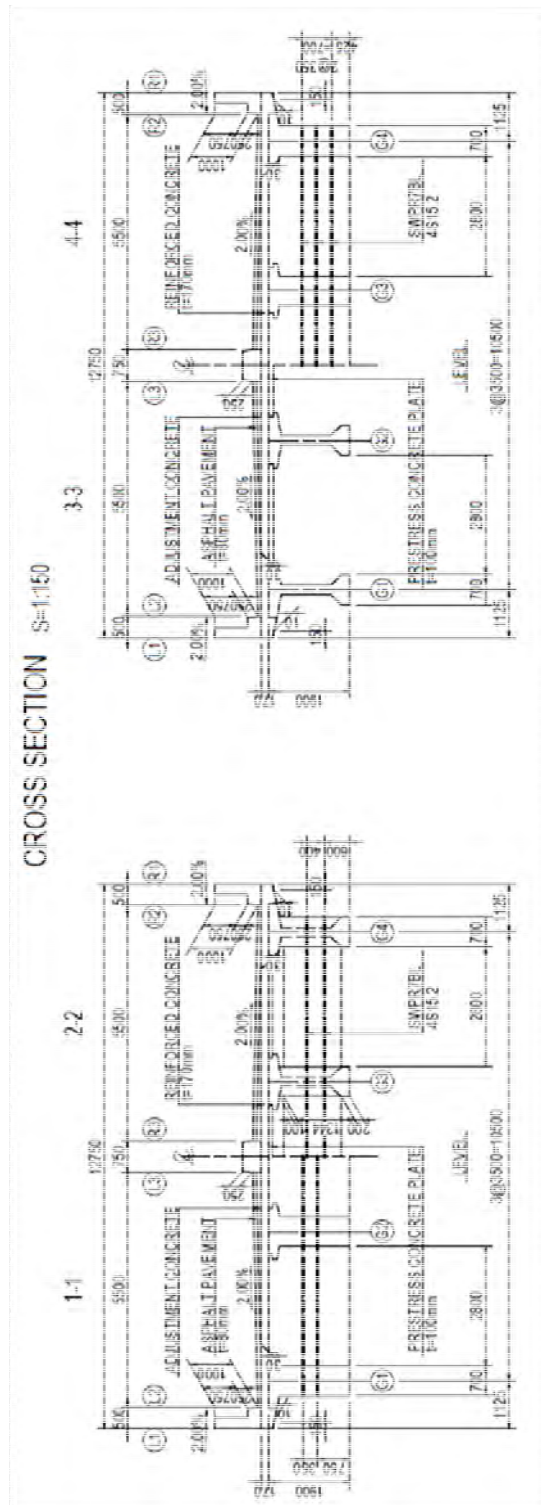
and Figure 4.6.43 show the profile, plan, and cross section of PF14-AF2.
